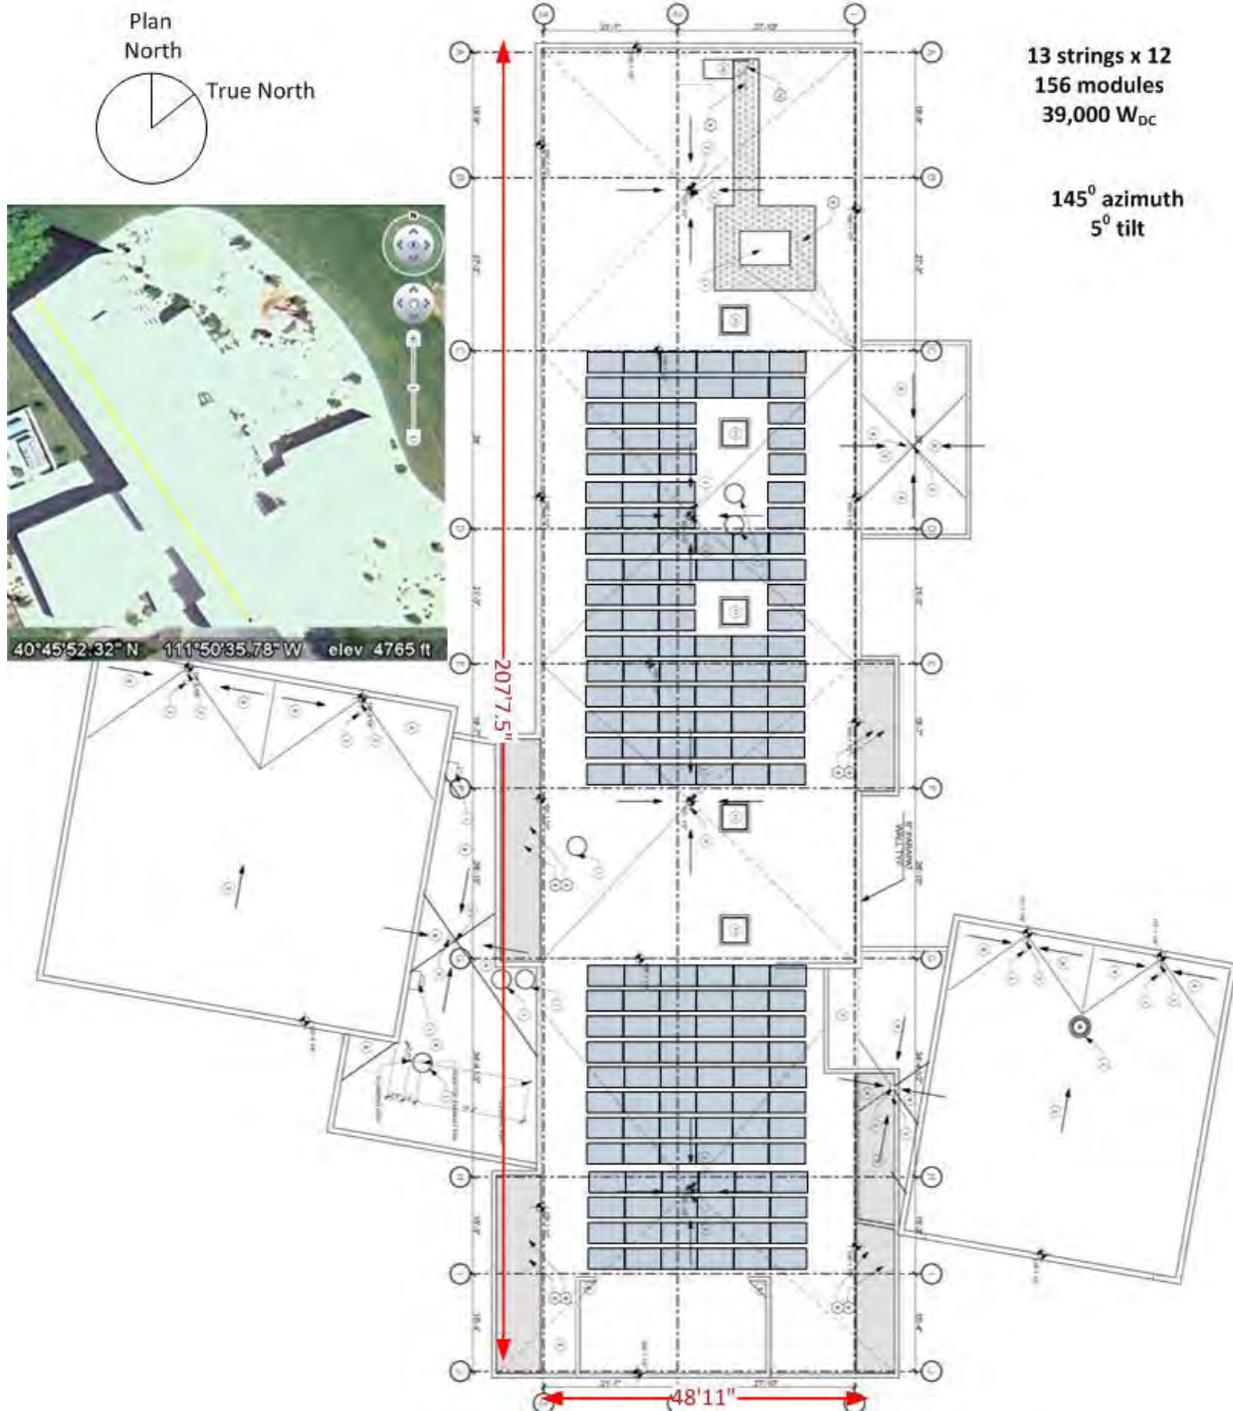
Tanner Example Lay-out (5° tilt, 4' Center Spacing, Landscape, Azimuth 145°)
